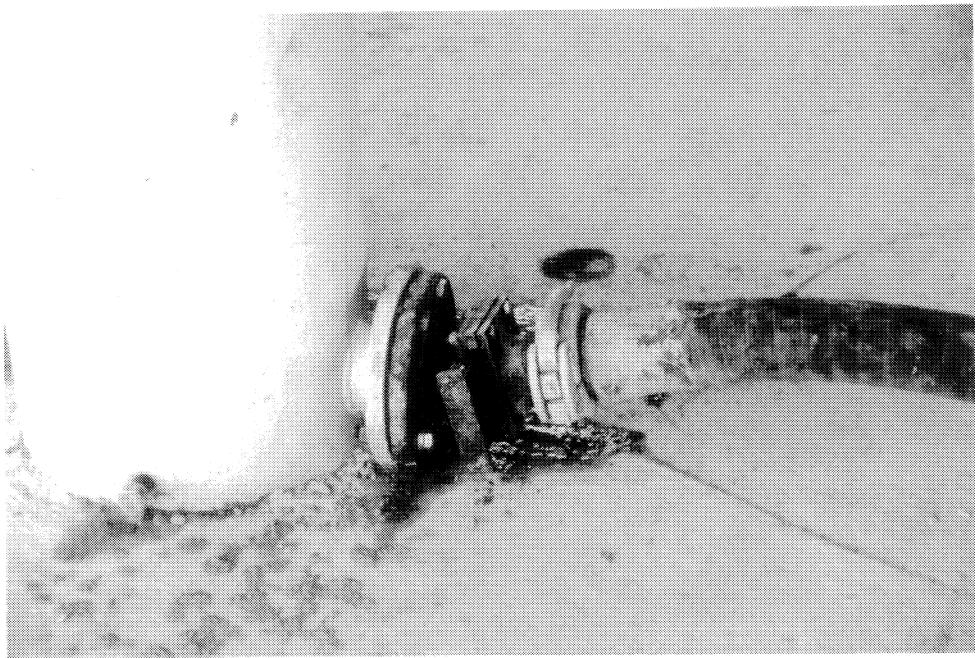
Pumping concrete into a CHS column from the bottom
